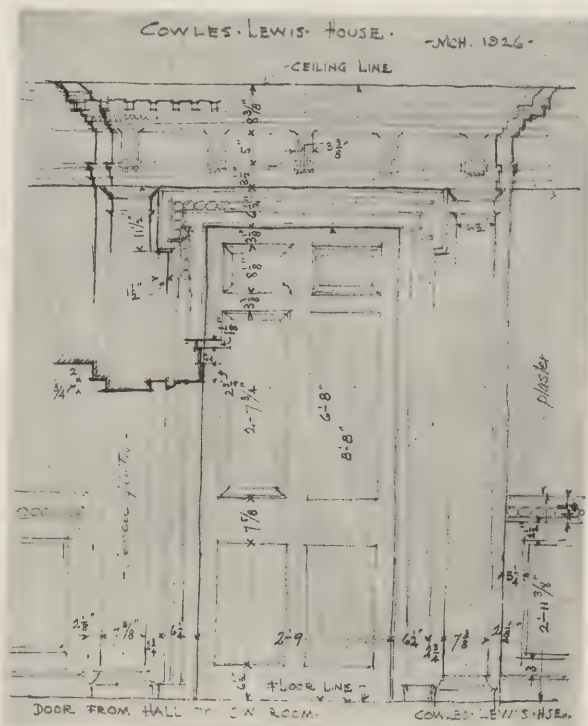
DETAILS OF DOORWAY, SKETCHED IN FIELD
